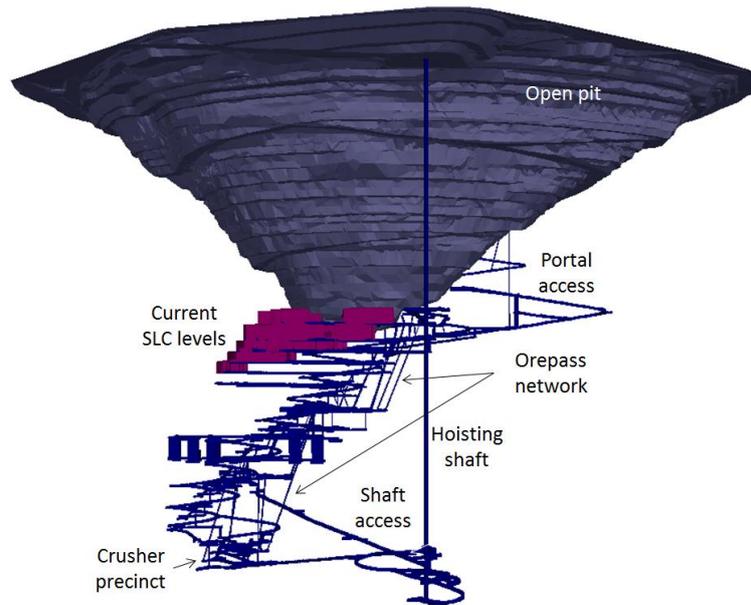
Oblique view of the open pit and underground mine at EHM looking west
